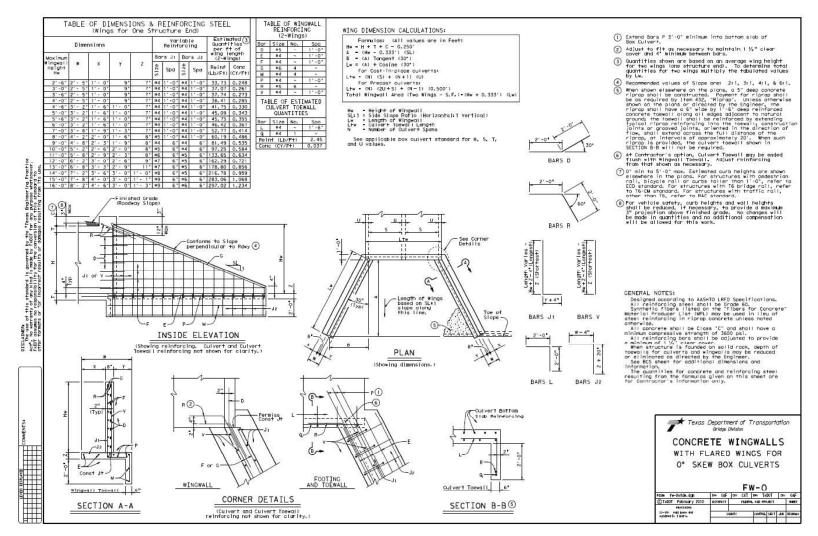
C-3. TxDOT Standard Detail FW-0 for Concrete Wingwalls
